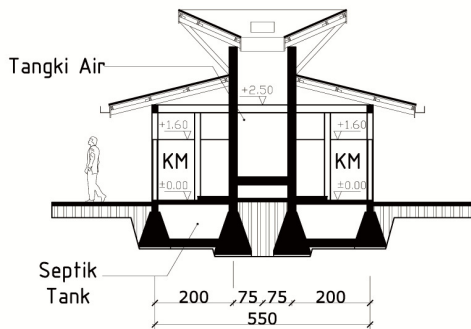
The Section of Integrated Bathing - Washing - Toilet - Water Tank Facility.
